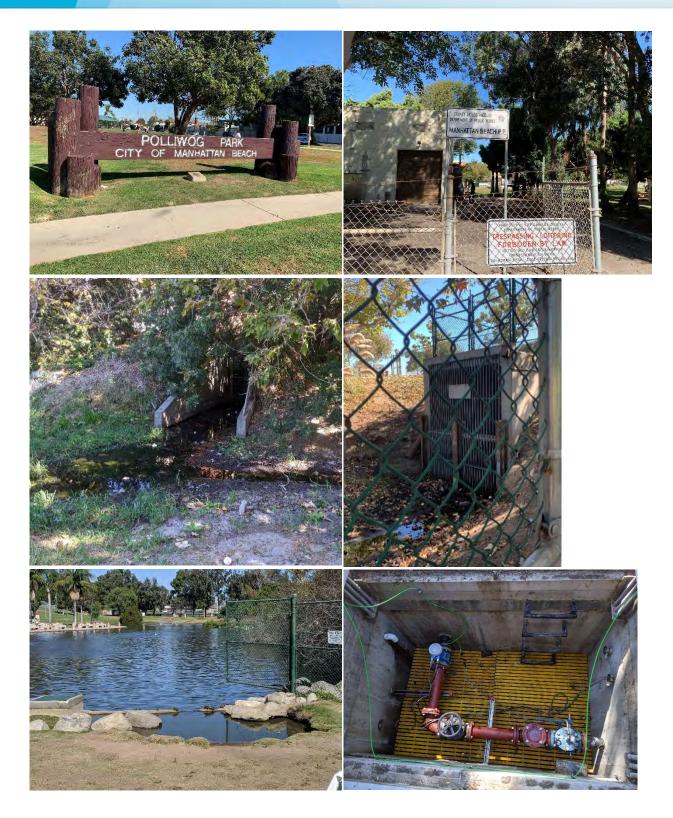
Manhattan Beach Pump Plant DWD and Storage at Polliwog Park Pond; Photographs taken during October 22, 2019 Site Visit with LACFCD Staff
